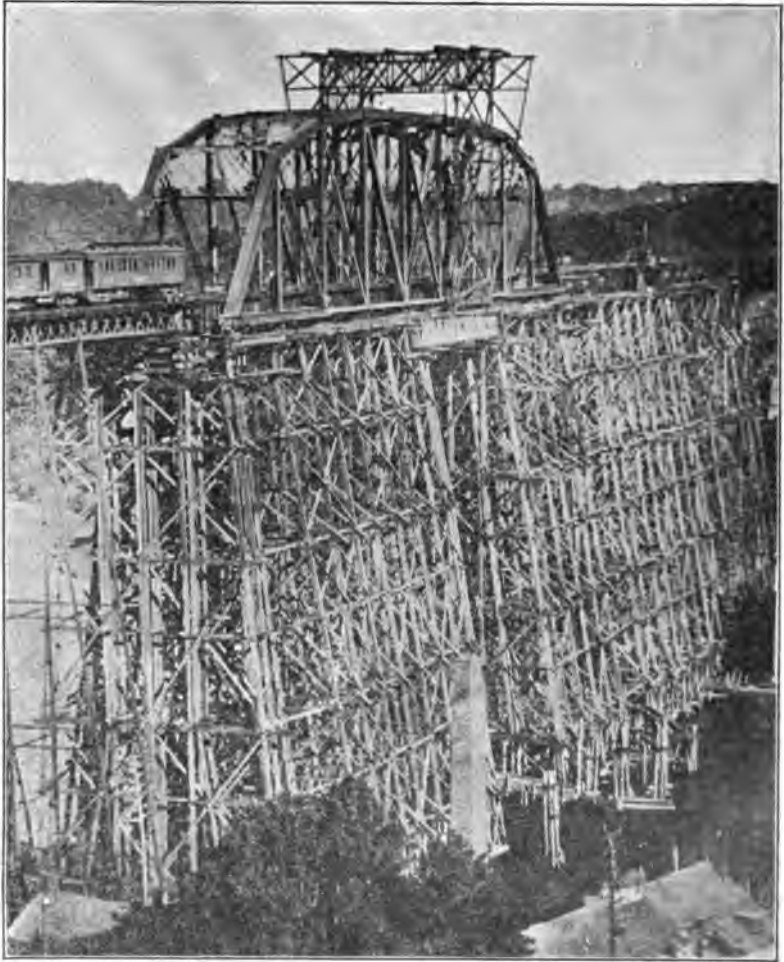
Falsework Supporting Bridge during Erection, American Bridge Co., Ambridge, Pa.
